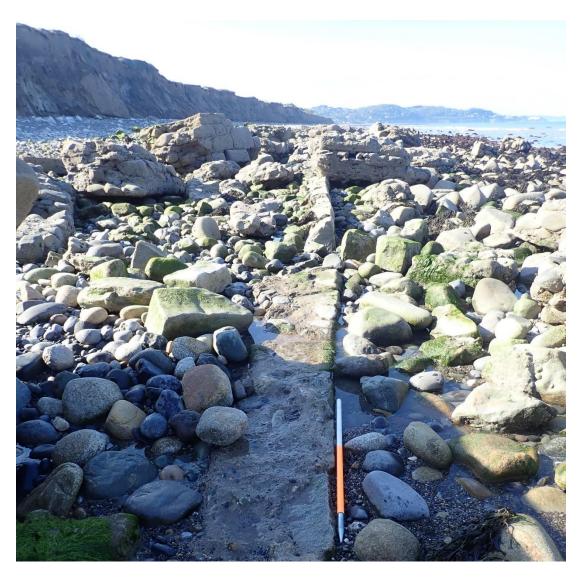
View looking north at base of retaining wall showing location where a further chunk of the collapsed wall survives. Position of image indicated on Figure 4.
